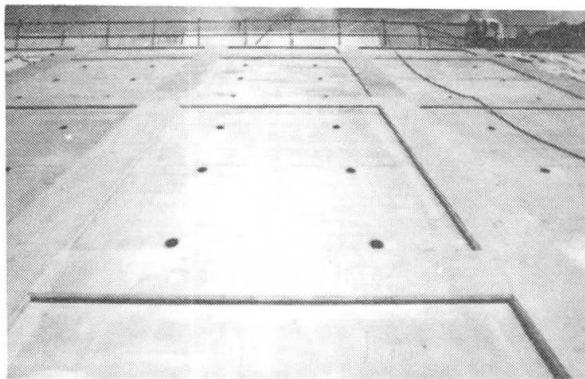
Inclined retaining wall of Aseishigawa dam (Aomori pref.) [2]
